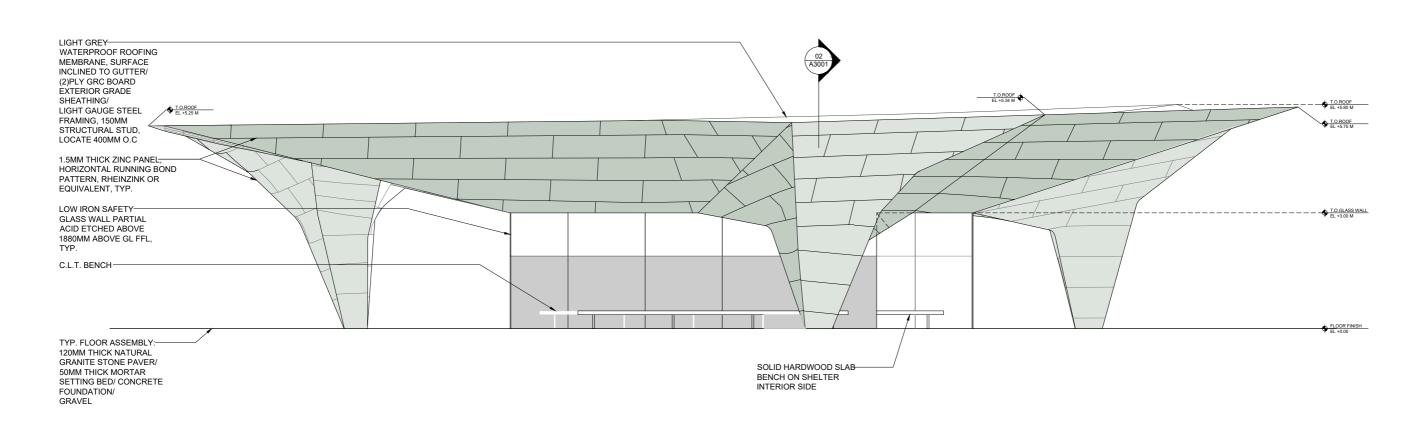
BUS INTERCHANGE W. SHELTER ELEVATION, SCALE=1/100
